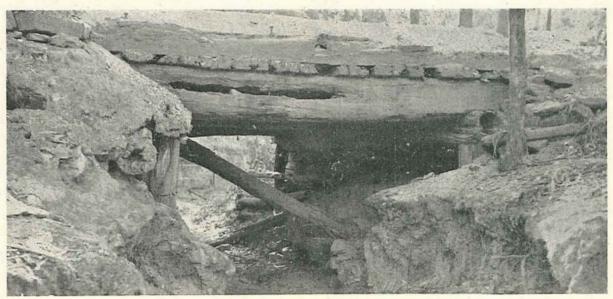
An Old Timber Culvert at White's Mill on the Mandurang Main Road, Strathfieldsaye Shire.
